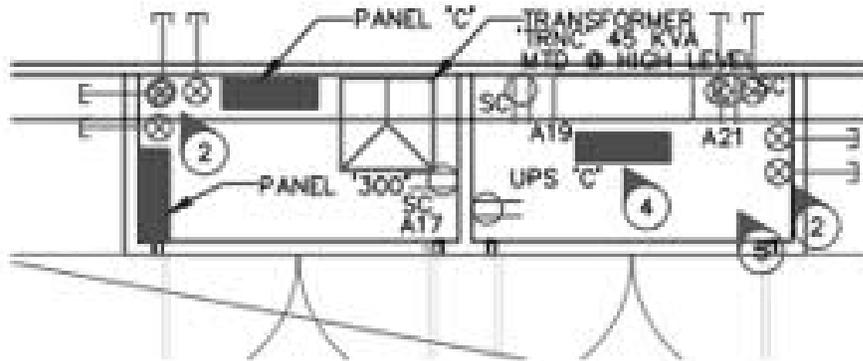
Plan View Layout – Main Floor – Electrical Room #3
